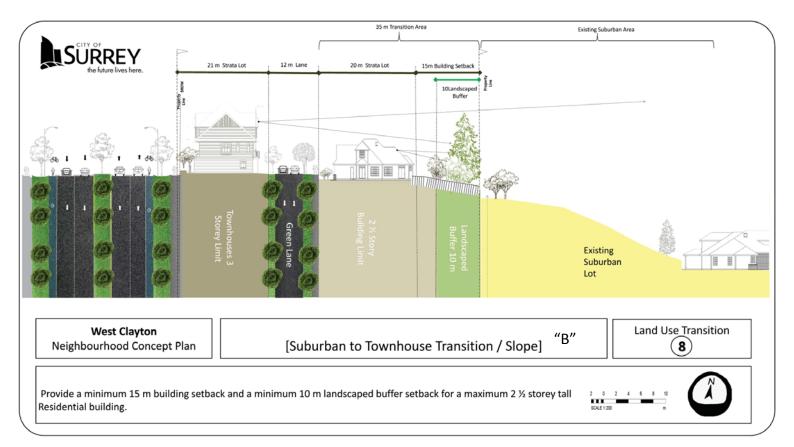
Landscape Buffer and Special Residential Townhouse setback adjacent to Suburban Edge "B".
